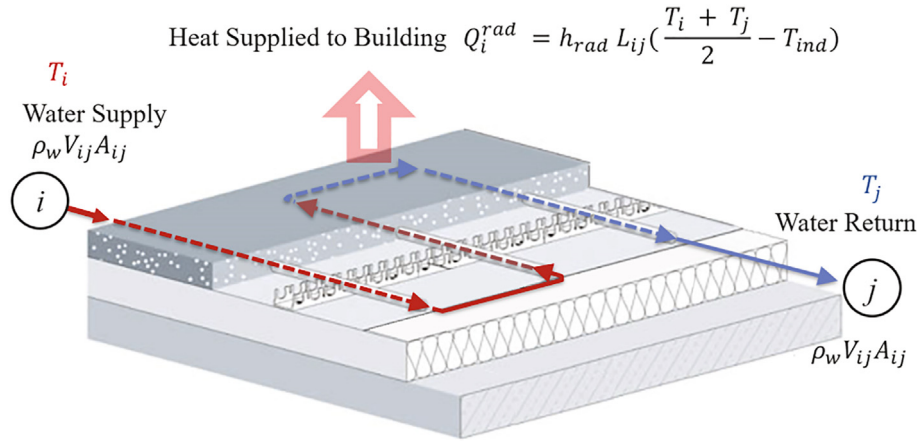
Construction details of the radiant floor emitter inside building blocks.
